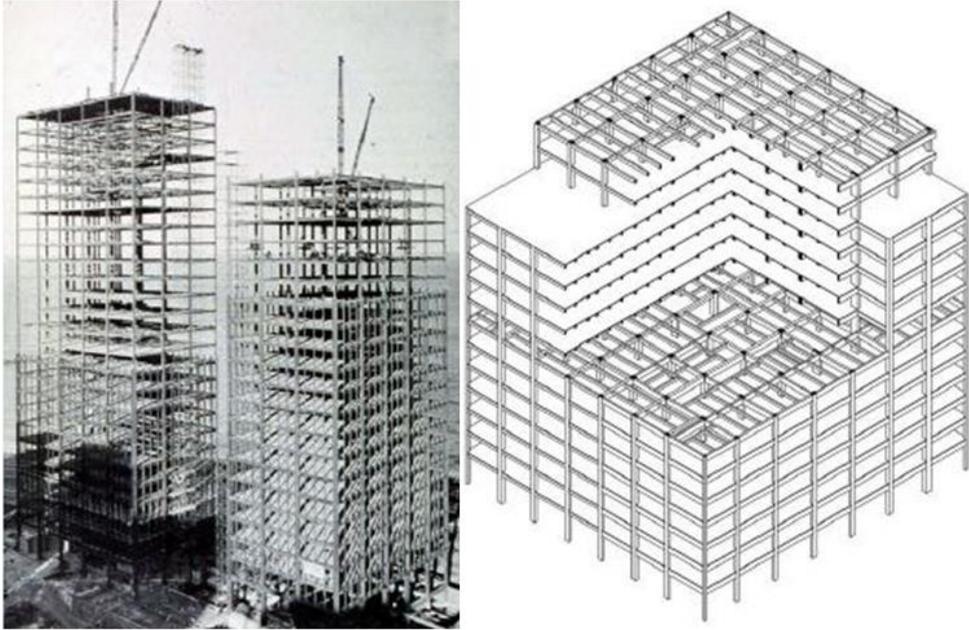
Lake Shore Apartments – Rigid Steel Frame Structure (left) and Stanhope Building – Rigid Concrete Frame Structure (right, axonometric) [179]
